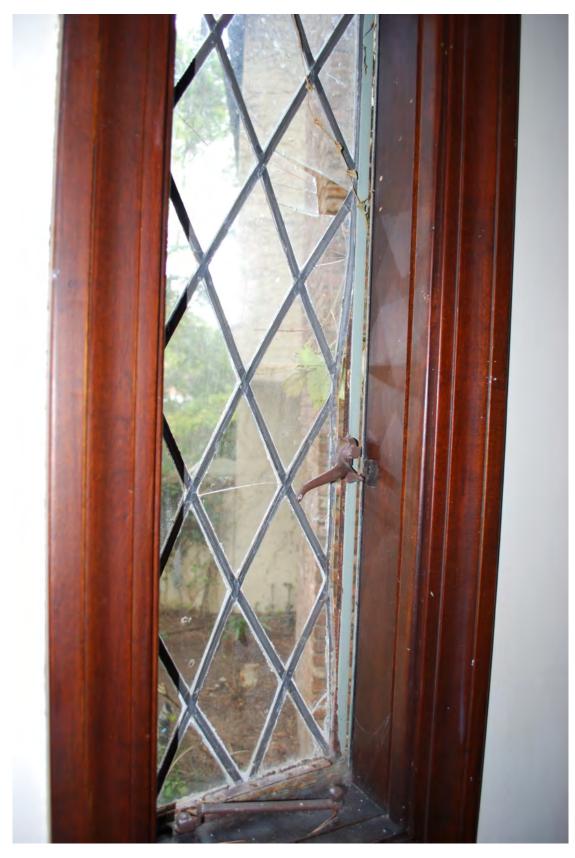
Leaded glass casement window showing damage, 2017. Photo credit: V.Withers
